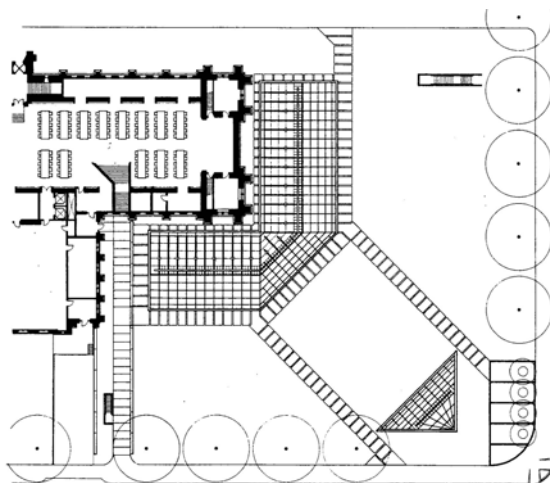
Law library grade level plan showing the entrance from the original building to the new addition.
